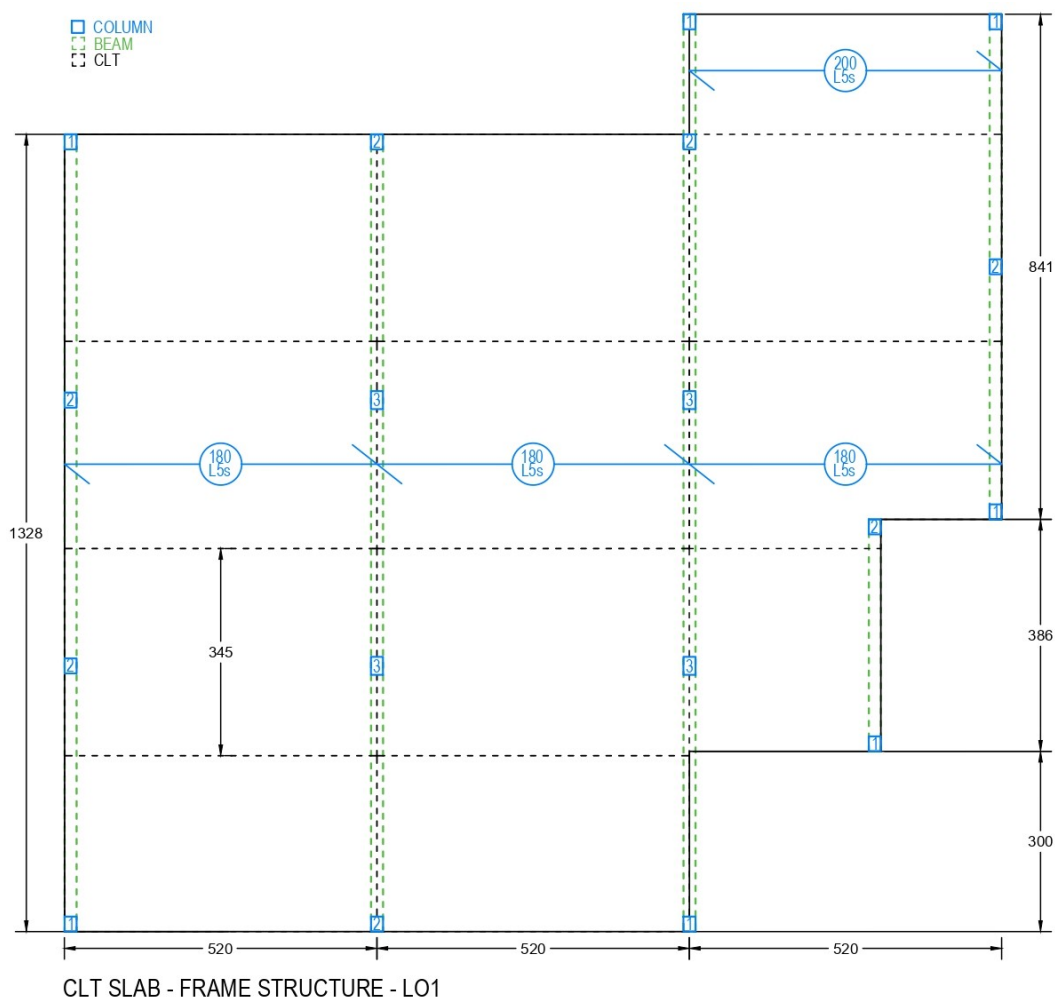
Conceptual structural design plan of the functional unit with CLT slabs - LO1
